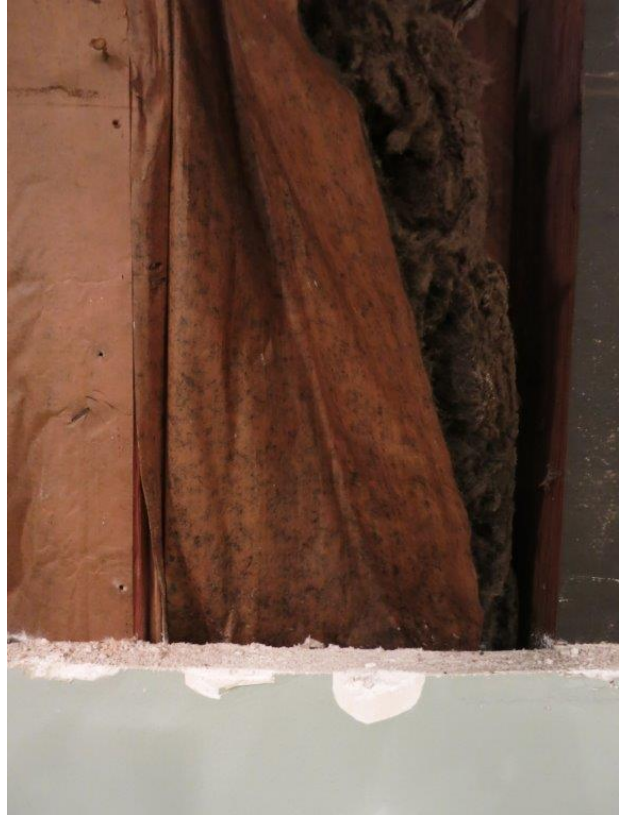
Mould on Paper-Backed Insulation in Wall Cavity
